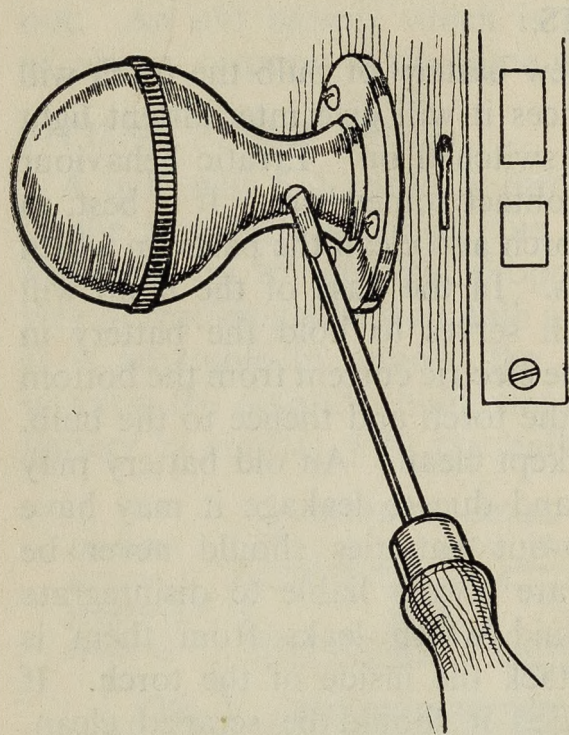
To remove the door handles unscrew a small screw in the side of one of the handles.
